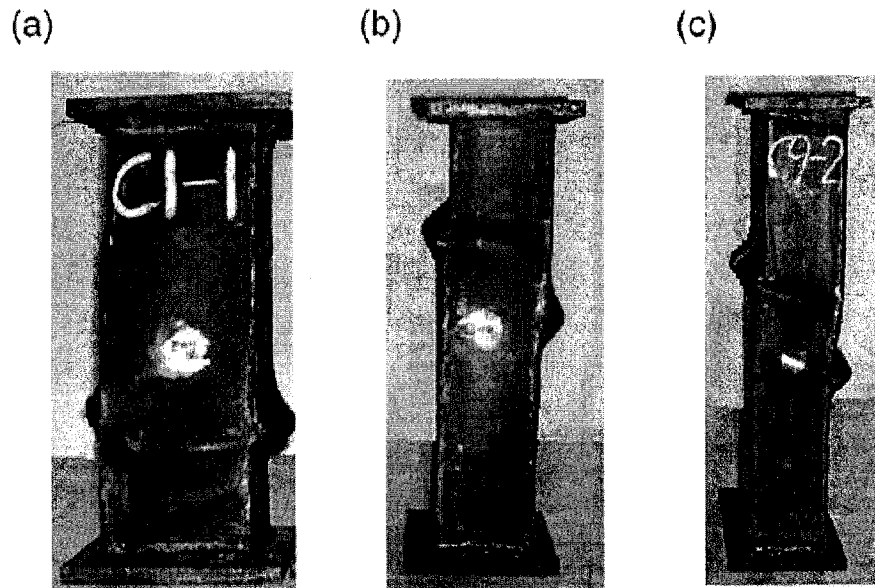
Typical failure modes of concrete-filled box columns [1]
